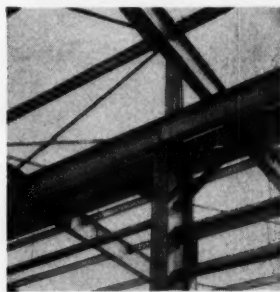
Simpler Details Method for attaching crane girders to beam columns. Small stub column welded to top of W. F. beam supports roof girder construction.
